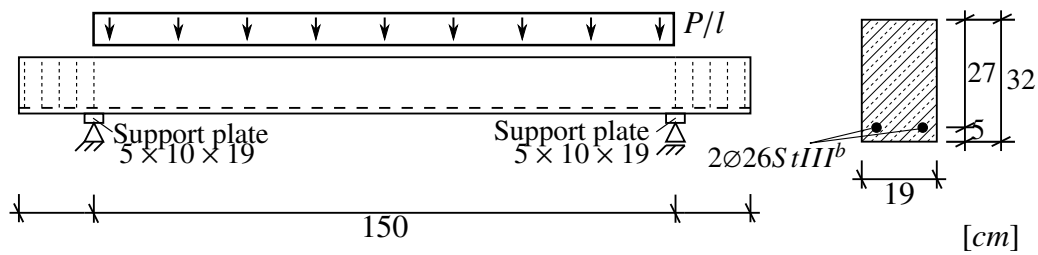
Parameters of the reinforced concrete beam without shear reinforcement V11/1 taken from [103]
